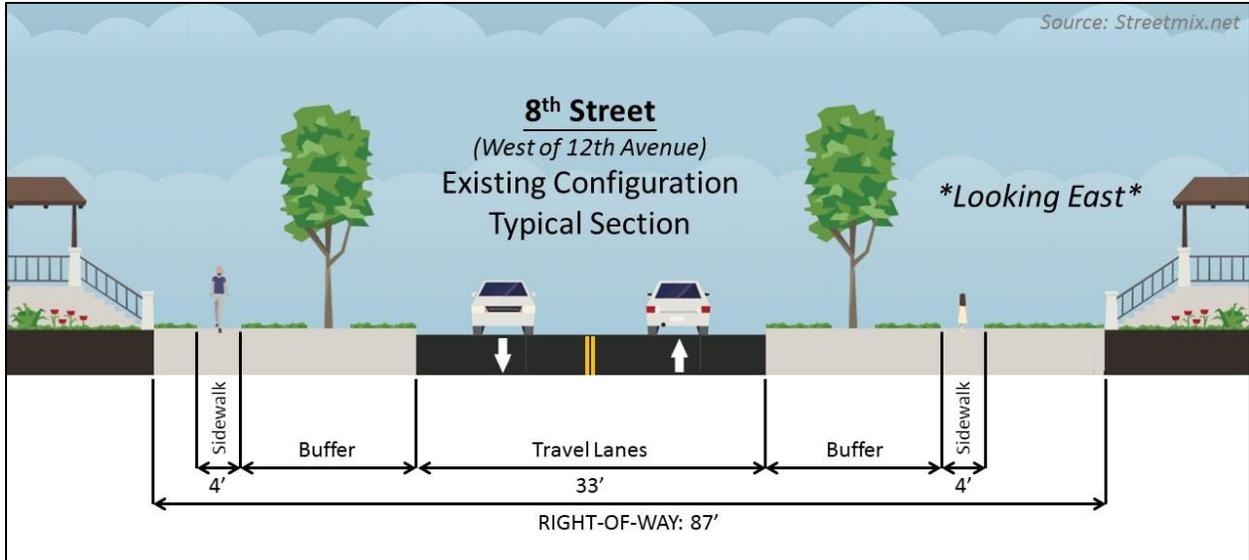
8th Street Typical Cross Section, West of 12th Avenue
